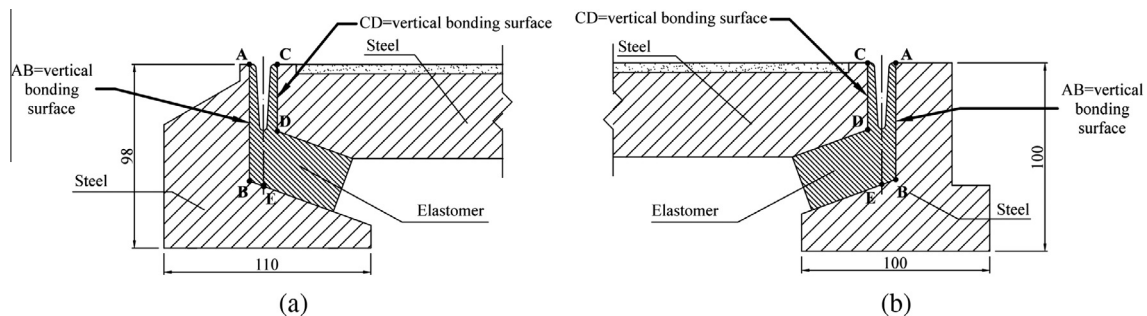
The "old design" left (a) and right (b) ends of the joint. Dimensions in mm.
